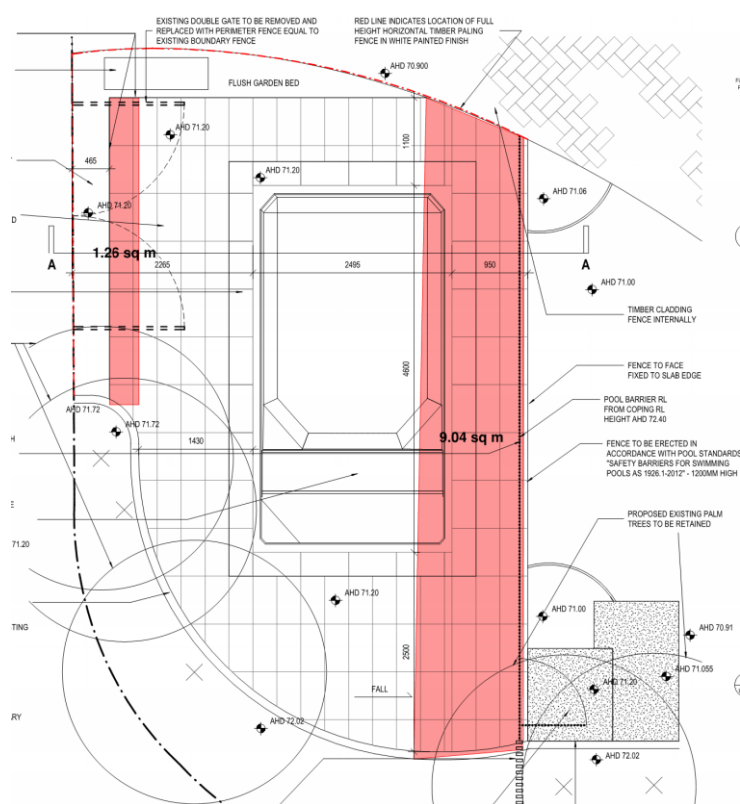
Highlighted area of pavement deletion – Pool re-aligned
